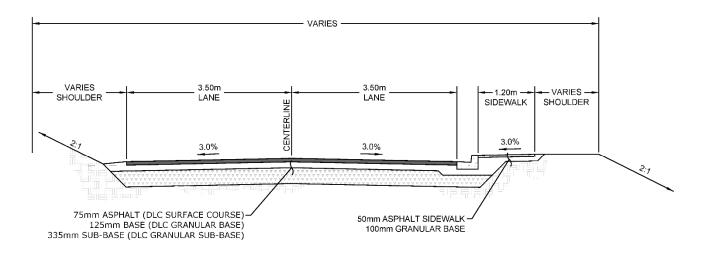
Typical Road Section showing proposed OK Centre Rd E improvements
